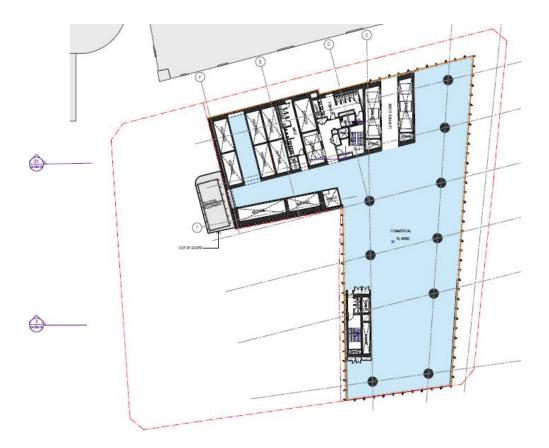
Proposed Level 13-17 - typical tower low-rise commercial office floorplate
